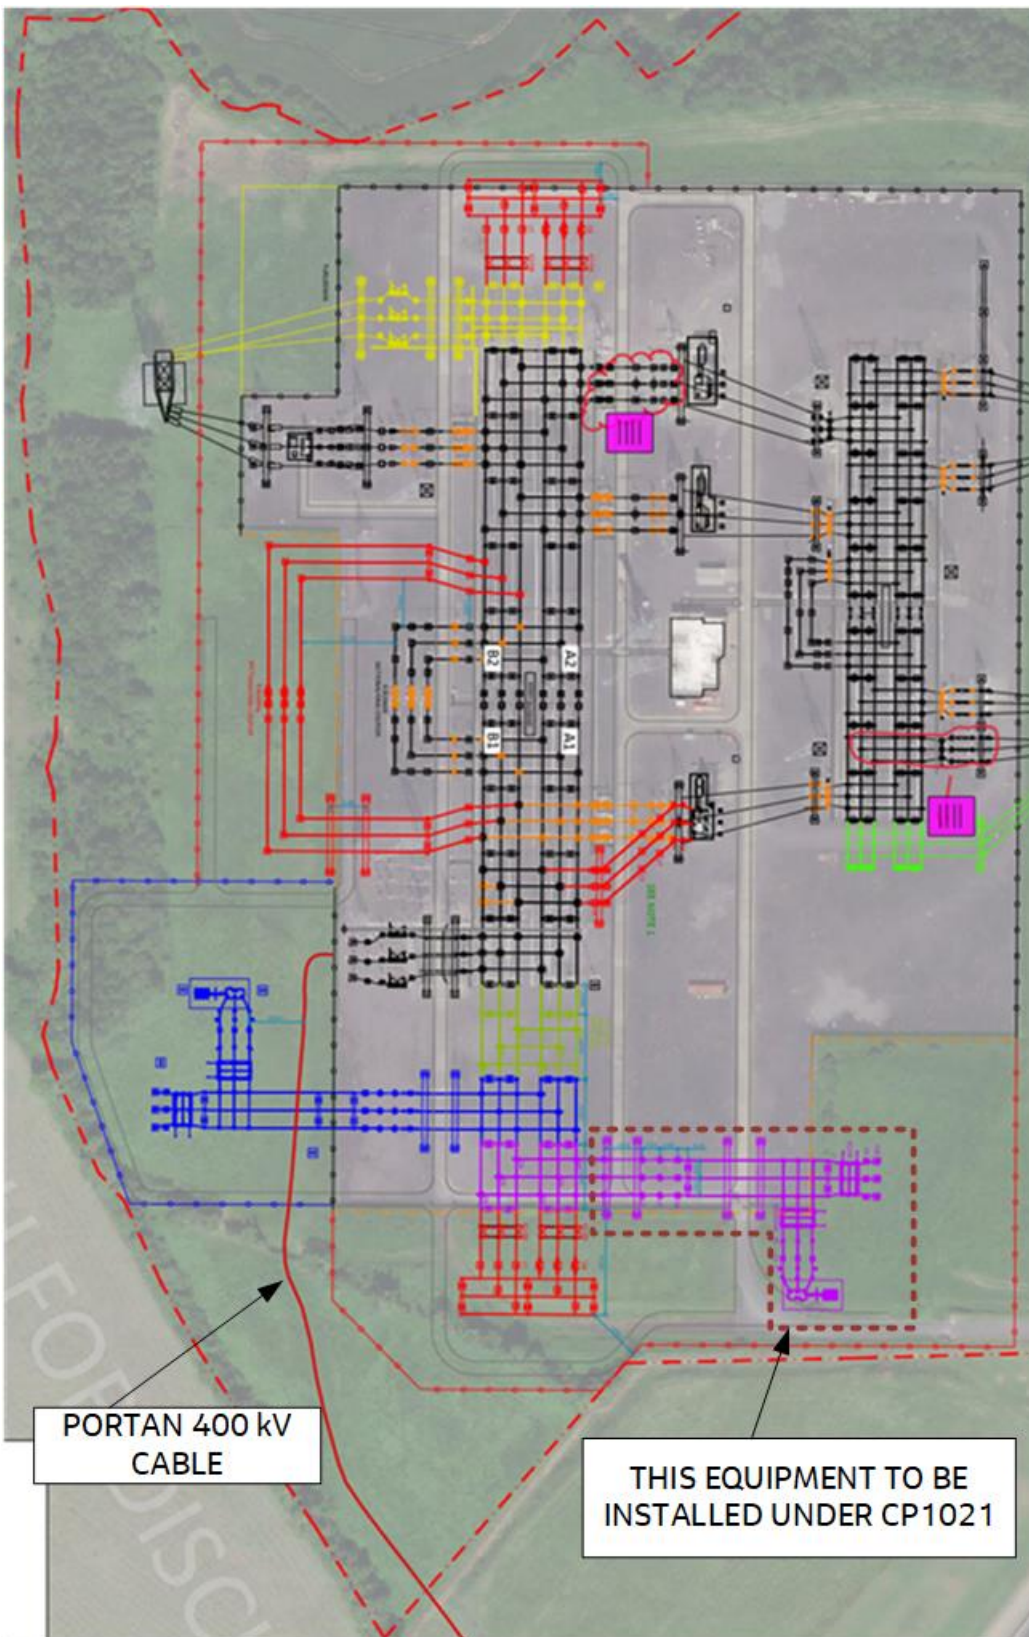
Woodland Proposed Layout. Coloured sections constructed under project CP1194 except where noted
